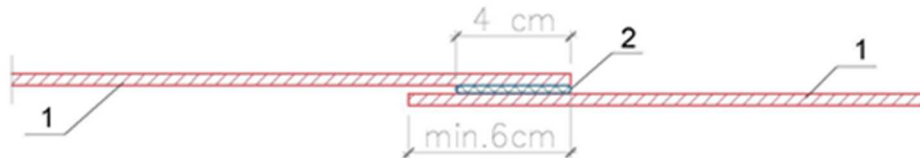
LONGITUDINAL CONNECTION OF MEMBRANE STRIPS – CROSS-SECTION
